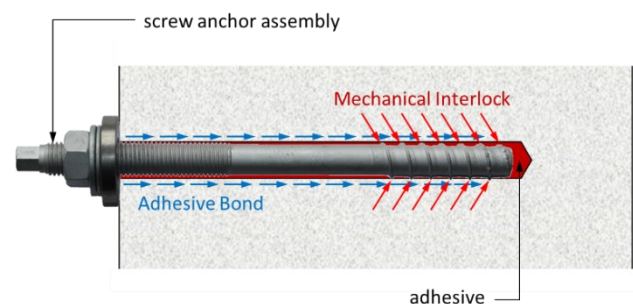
Würth RELAST bonded screw anchor and its load-transfer mechanism.
